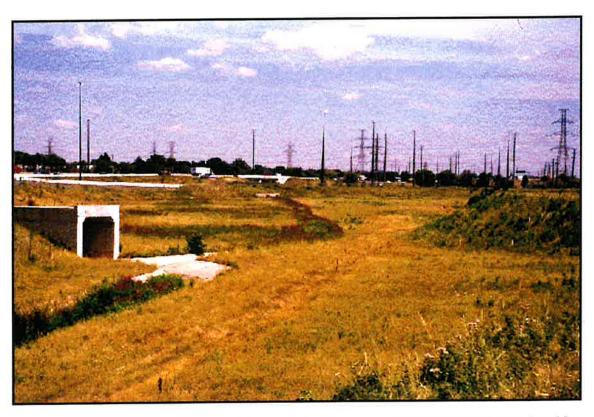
Looking upstream at the pond from from the previous location atop the berm, with the 5.05 x 5.05 metre culvert on the left and the 1350 mm culvert in the centre.
